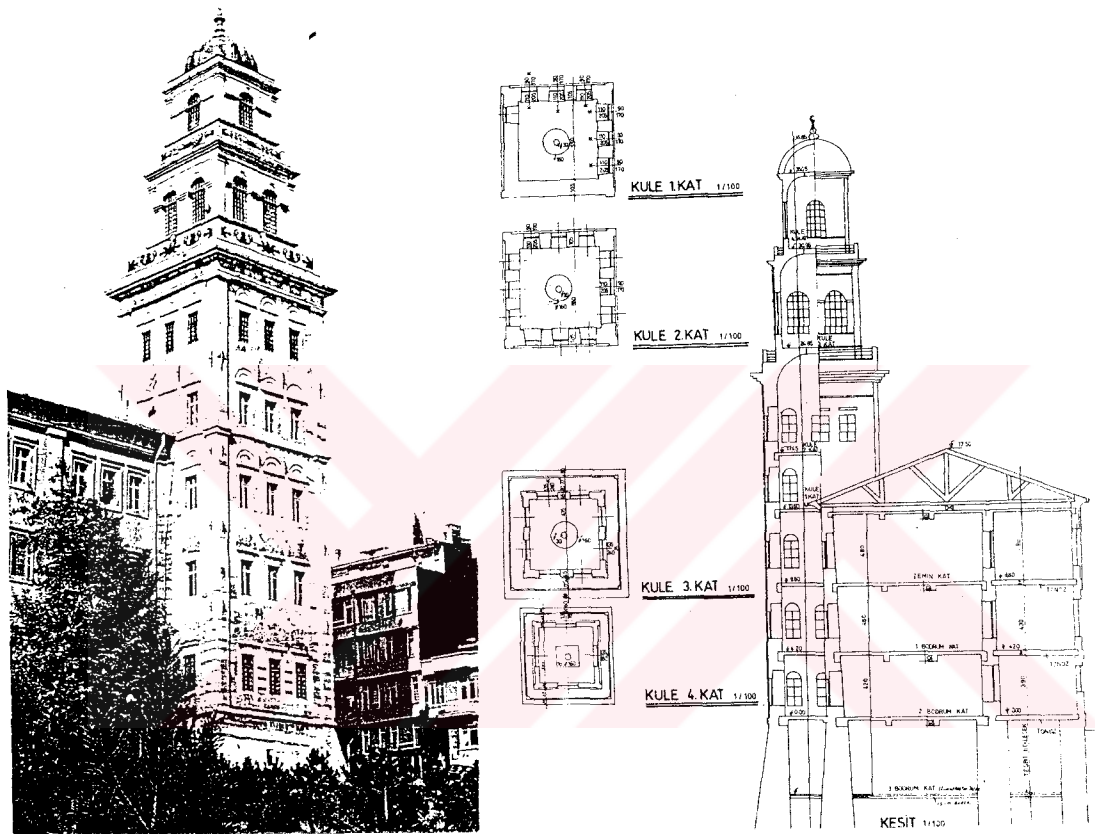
Cross-Section and Plan of One of the Towers of Selimiye Barracks.
